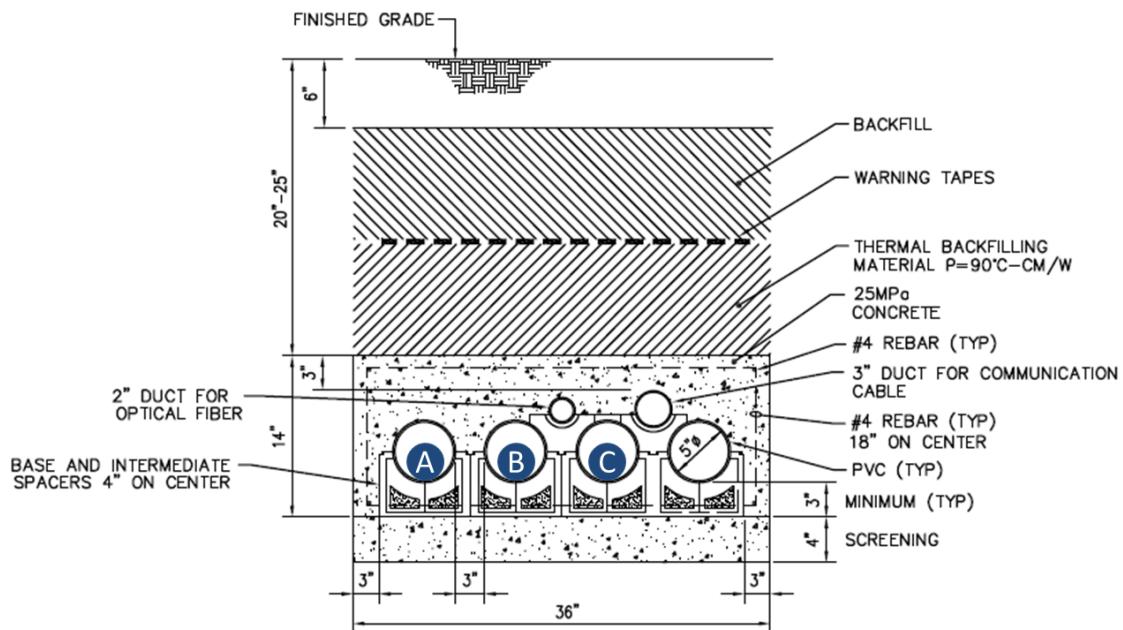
Onshore 69-kV duct bank where it is proposed to be constructed parallel to the railway.
